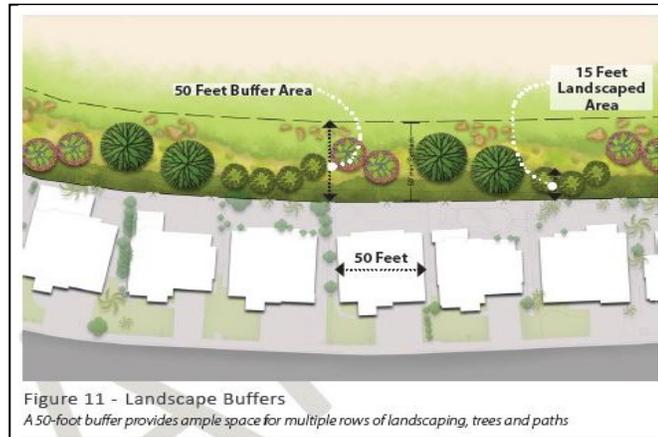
Design Guidelines Page 14 – This picture does show the buildings just beyond the buffer area, but there are still none of the paths, roads, or parking areas that are likely to be present. The Landscape Plans (Complete Plan Set sheets 43 through 56) show more details of the buffer area planting and most units have at least one area with less than 10' of actual landscaping shown. This suggests that hardscape such as driveways or parking spaces may be planned for those areas.
